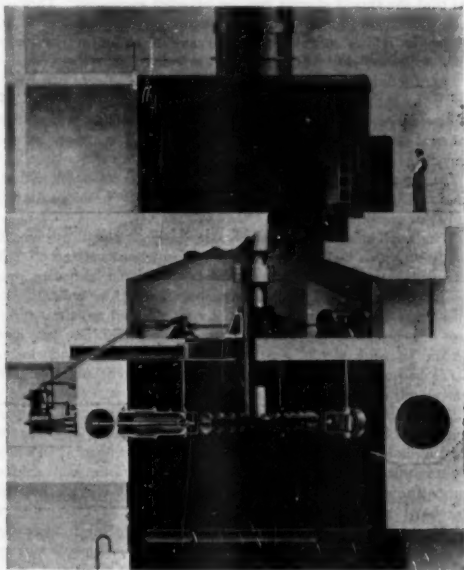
CLOSE-UP SECTION THROUGH TURBINE-GENERATOR
